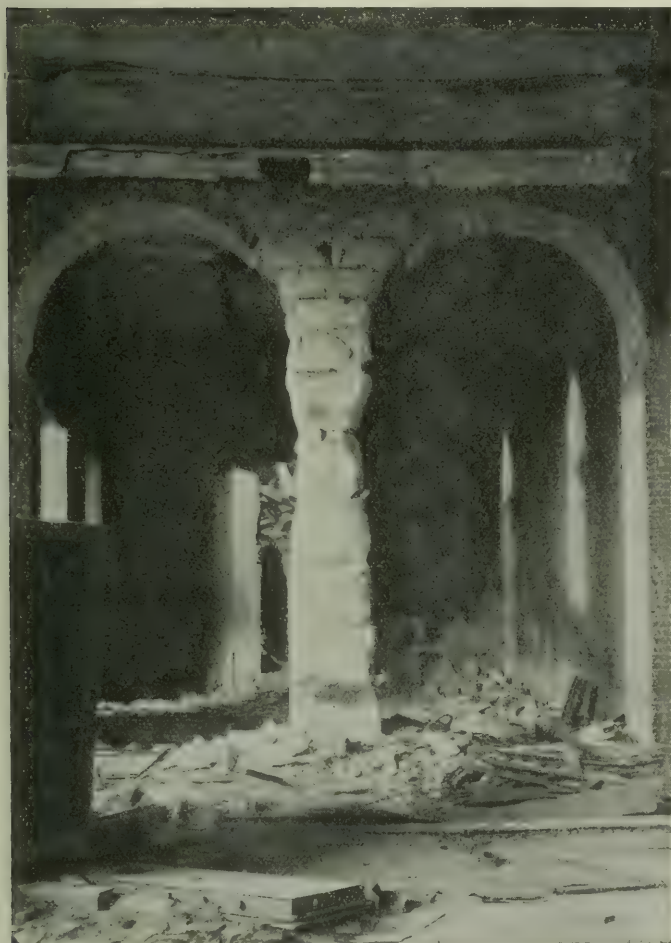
City Hall, San Francisco. Interior Column in Treasury Department critically damaged by Fire.
